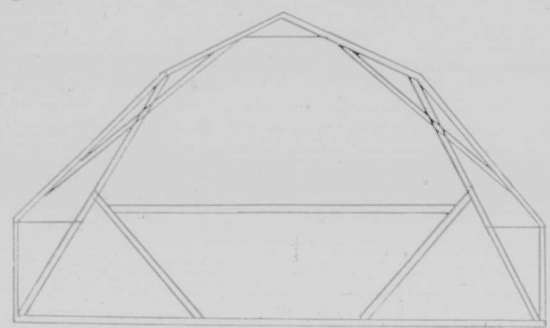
SHOWING A TYPE OF BENT AND ROOF THAT IS COMMONLY USED. THE ROOF IS TOO FLAT.
